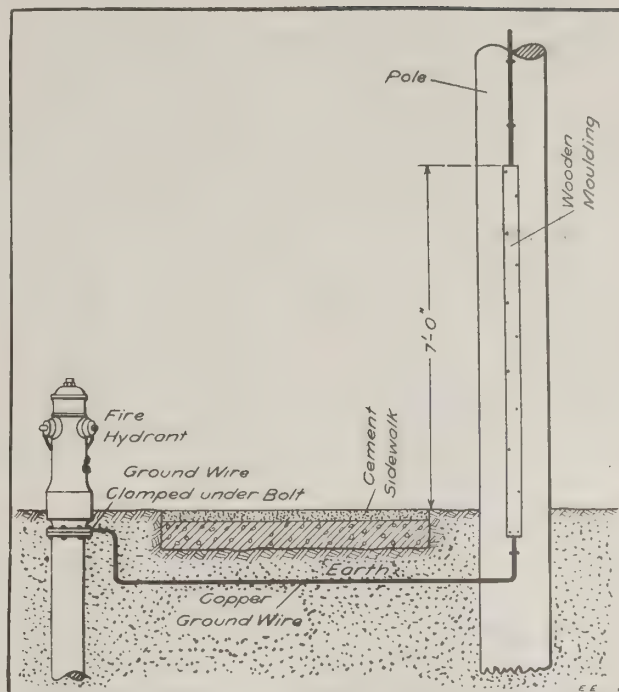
SECONDARY GROUNDED ON FIRE HYDRANT.
